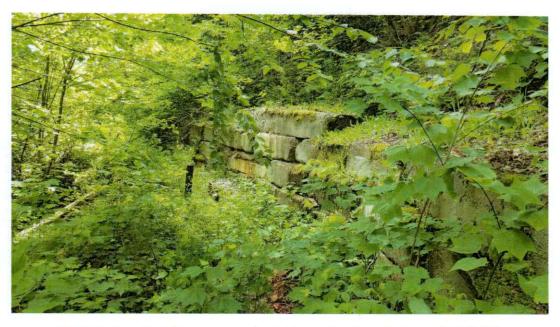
View of existing access road, retaining wall and monitoring well (6/13/23)
